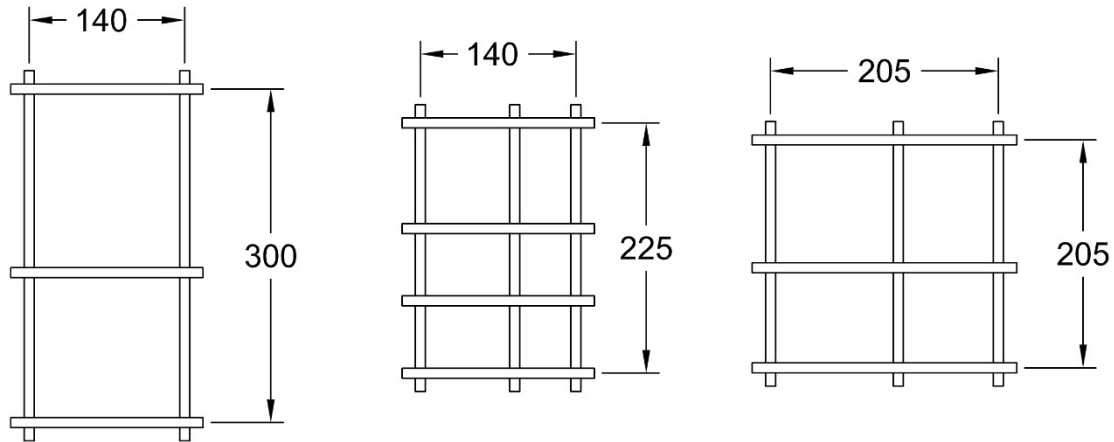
Grid Dimensions for Shear Wall Specimens: Walls 1 to 3 from left to right
